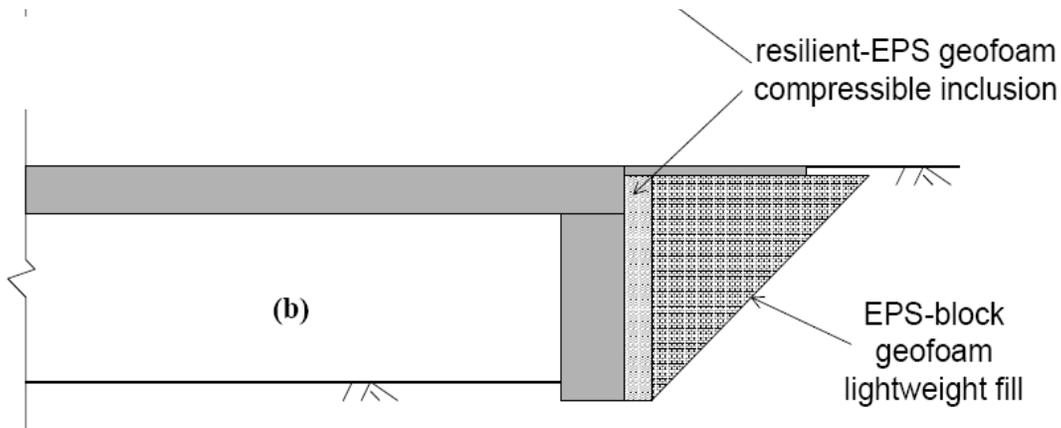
A design alternative by using geof foam as a backfill (Horvath, 2000)
